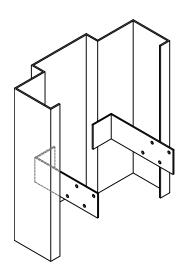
Weld in strap anchors wood/steel studs
